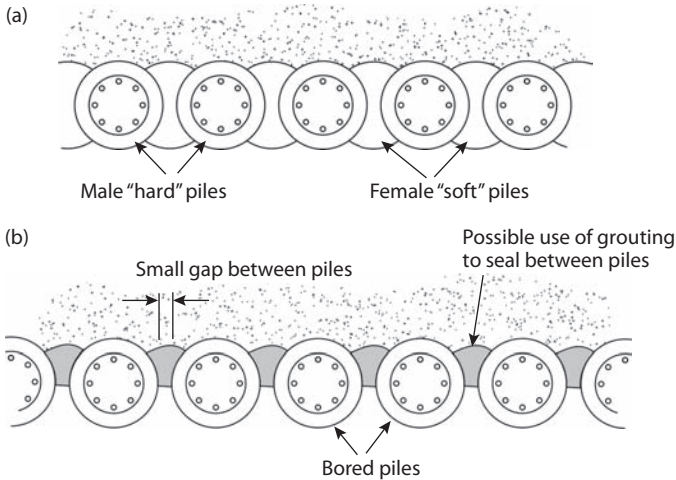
Bored pile walls. (a) Secant pile wall. Adjacent piles intersect to form a continuous wall. Female piles are installed first, and male piles are subsequently installed, cutting into the female piles. (b) Contiguous pile wall. Adjacent piles do not intersect, and a small gap remains between piles.
